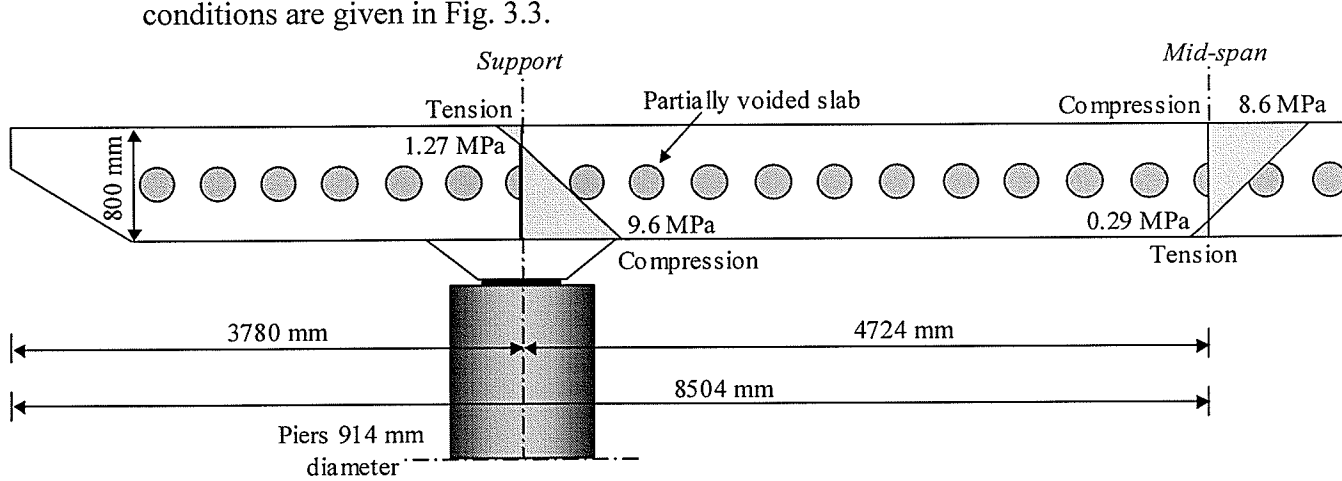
Stress profile at support and mid-span sections for bridge No.444 under service loading conditions
